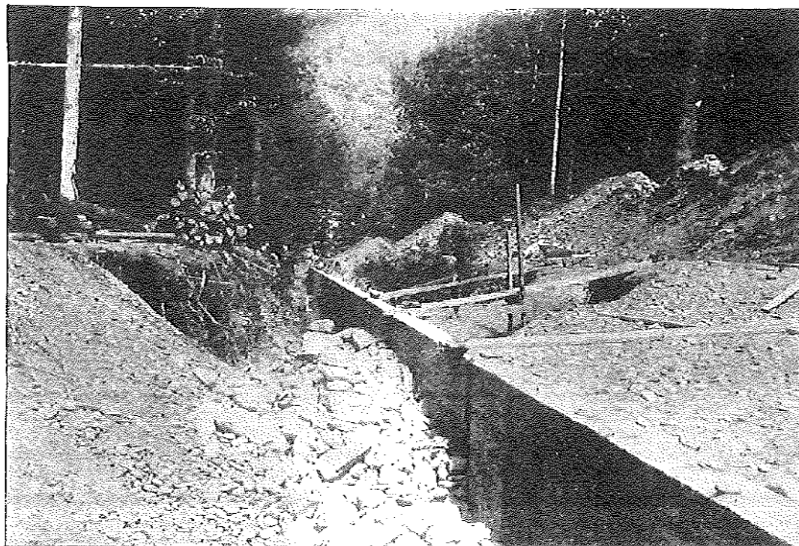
SELECTED STONE from the excavated material was used as backfill on the upstream side of the wall and around the collecting gallery.
